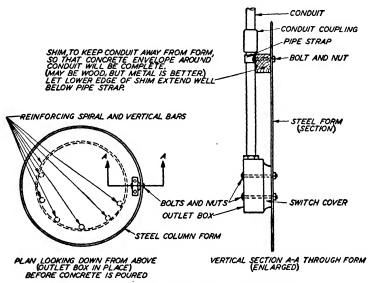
Method of Attaching Conduit and Outlet Box to Steel Forms for Circular Concrete Column
